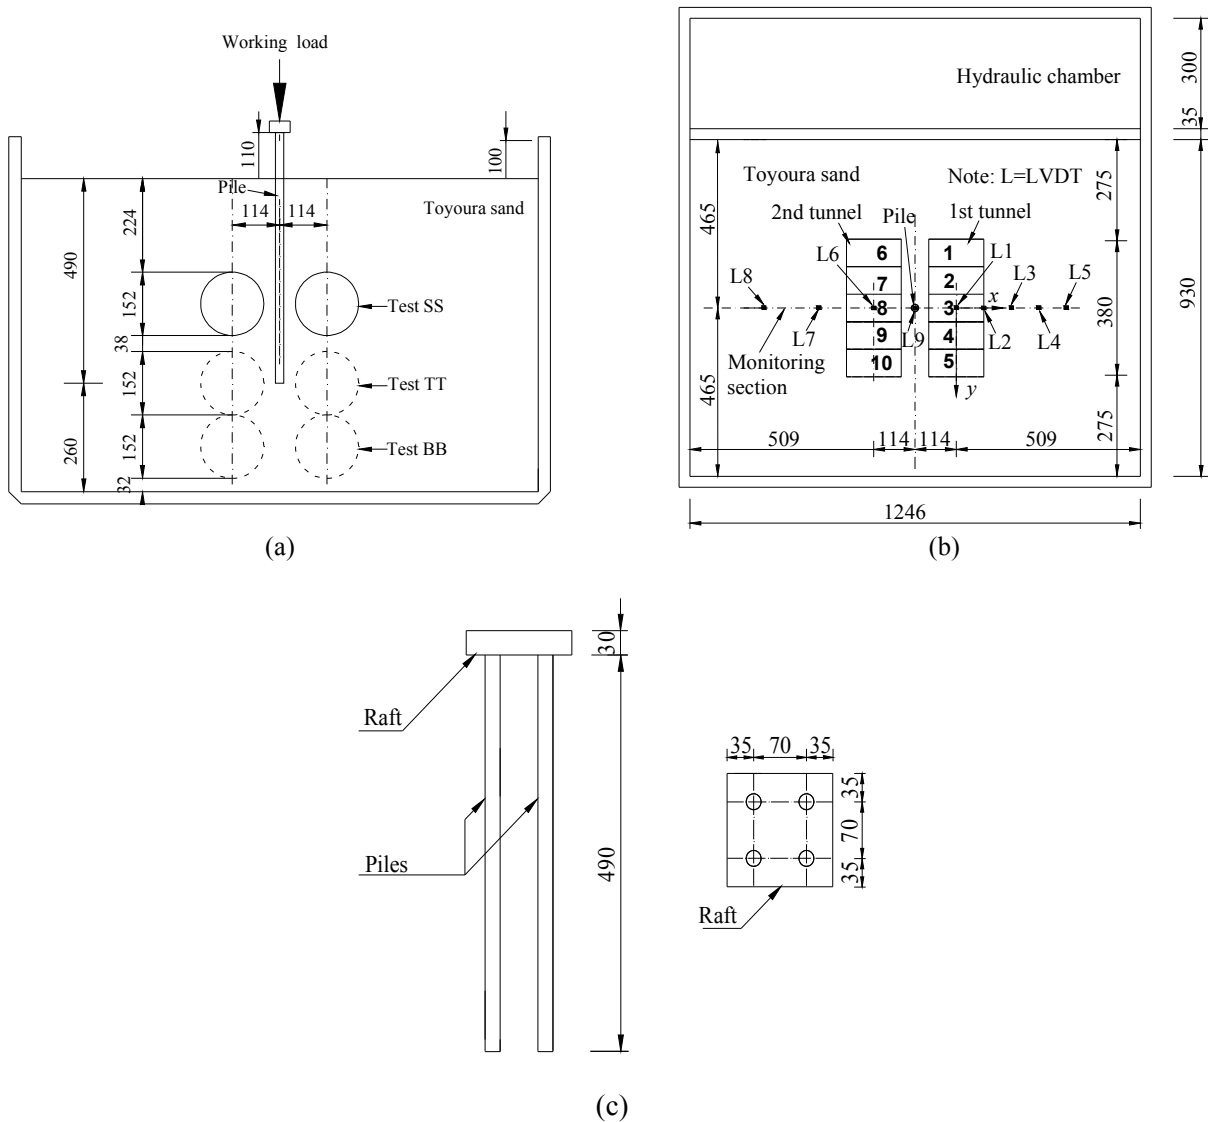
Configurations of the model piled foundation and twin tunnels: (a) Elevation view of a single pile and tunnels; (b) Plan view of a single pile and tunnels; (c) Dimensions of a 2x2 model piled raft. All dimensions are in mm in model scale.
